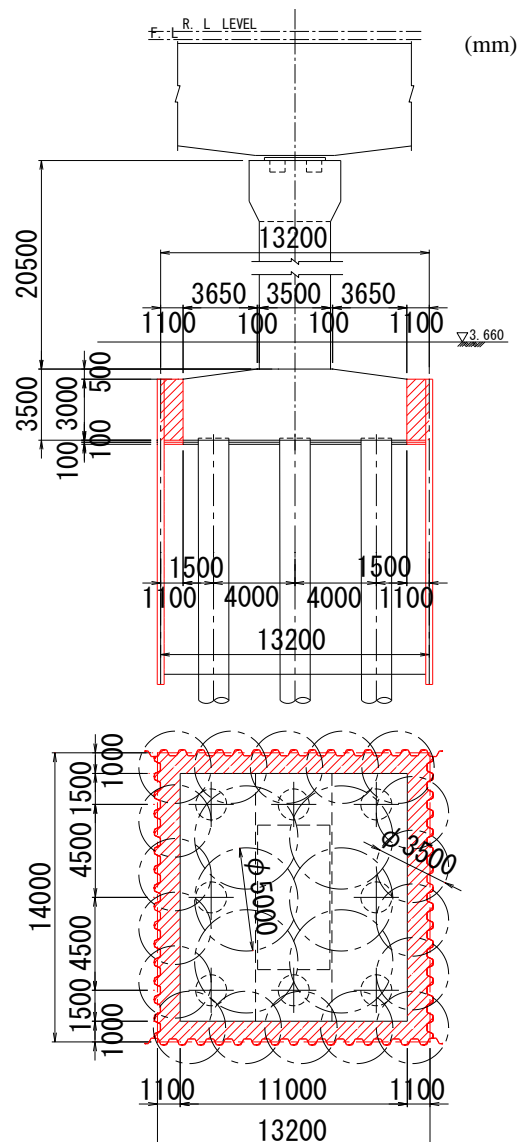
Drawings of the utilizing sheet piles and soil improvement (2P)
